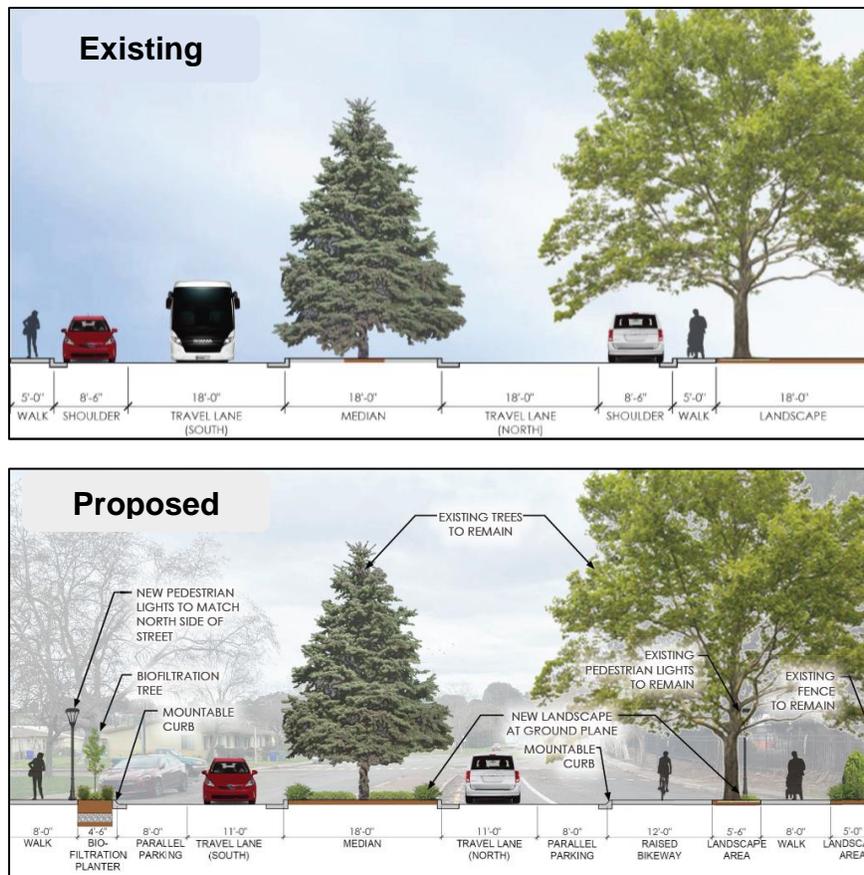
Cross Section View of Existing (Top) and Proposed (Bottom) Mission Bell Drive Improvements
